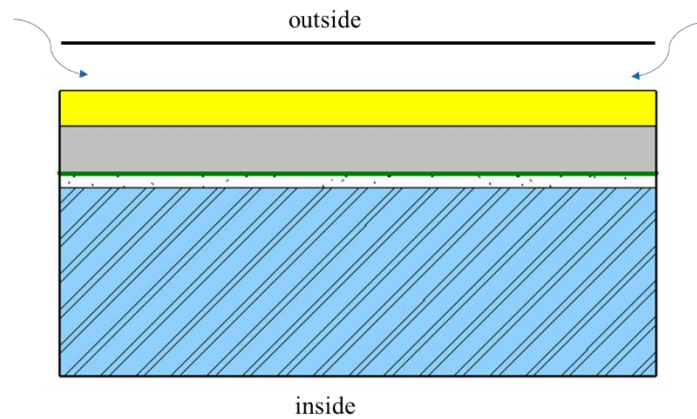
Wall composition after thermal retrofit (Alternative 3). From inside to outside: masonry brick, plaster, fiberglass (existing+new layer), rear ventilated façade
